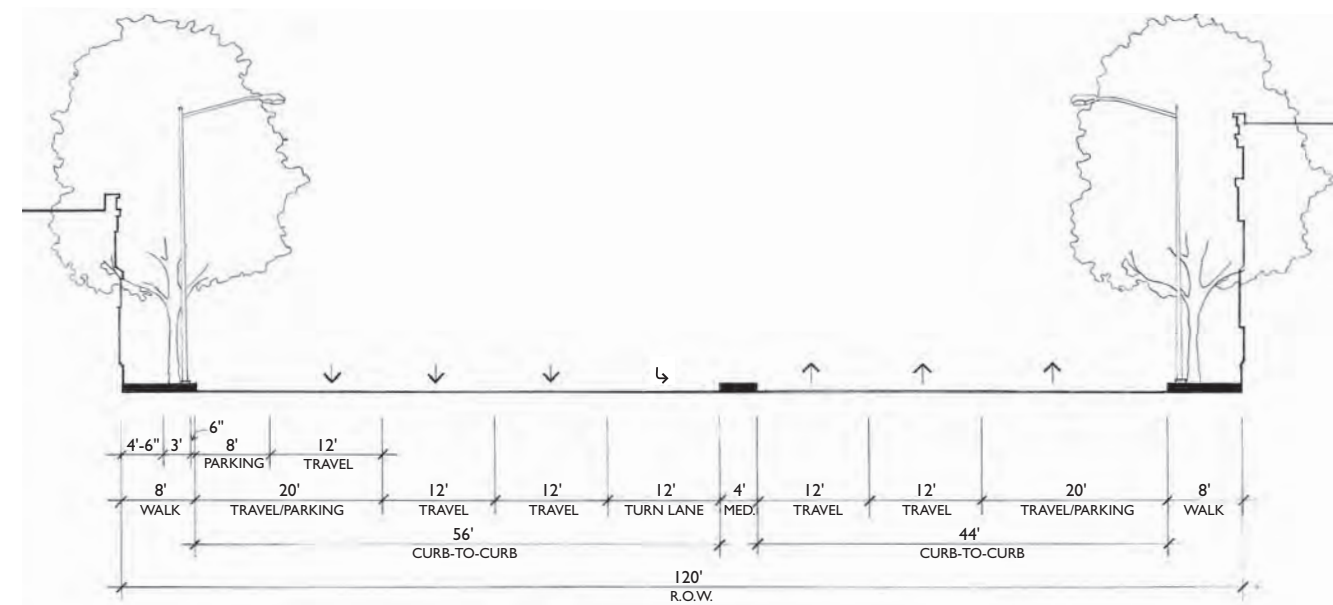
Typical existing cross-section of 'Urban' 6-lane at left-turn lane.
